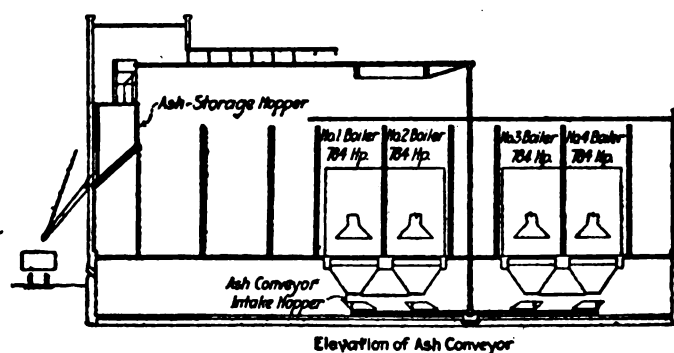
Air conveyor at Milwaukee sewage-disposal plant. Elevation.
